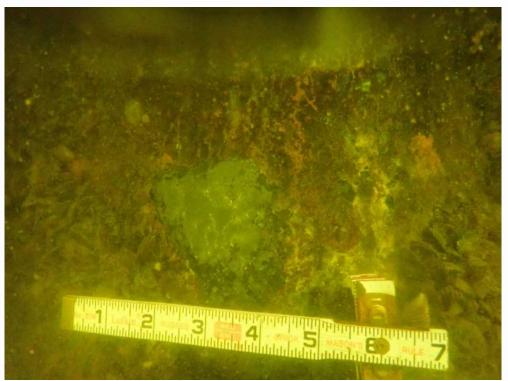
View of North Wall of Flushing Channel (Wall Section 3), looking north.
